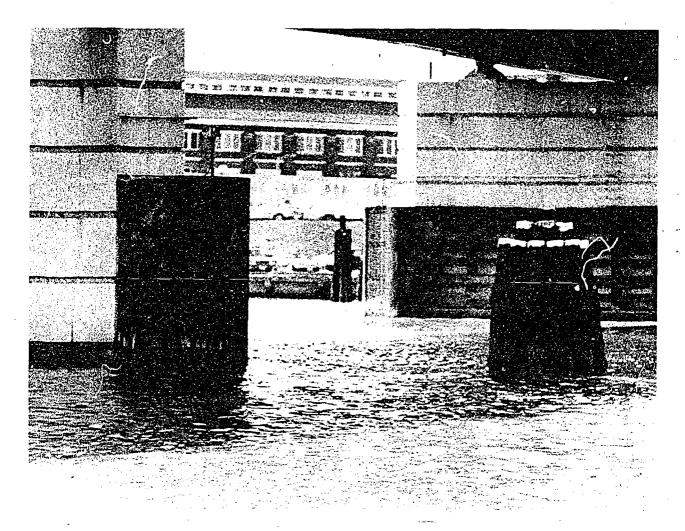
Timber pile cluster dolphins and timber fender system on pier.
